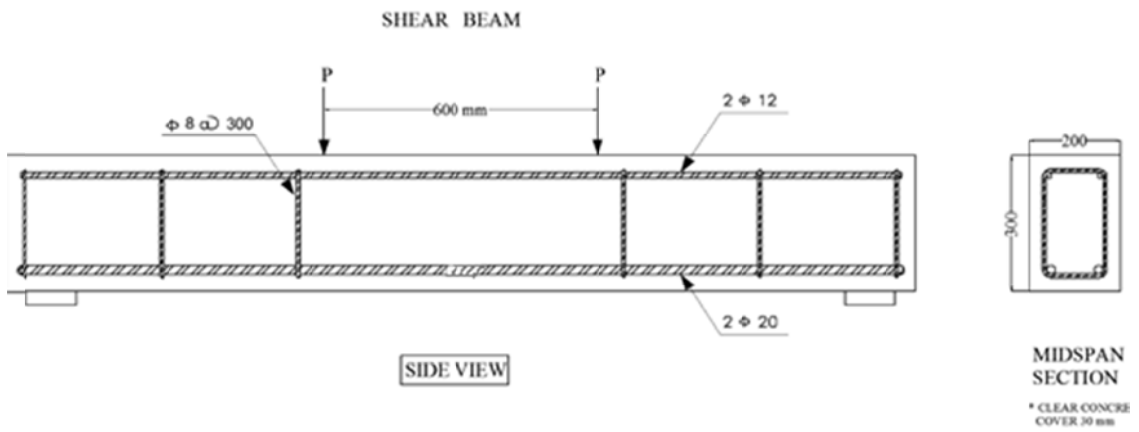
Shear Beams - Reinforcement Details; all dimensions are in mm.
